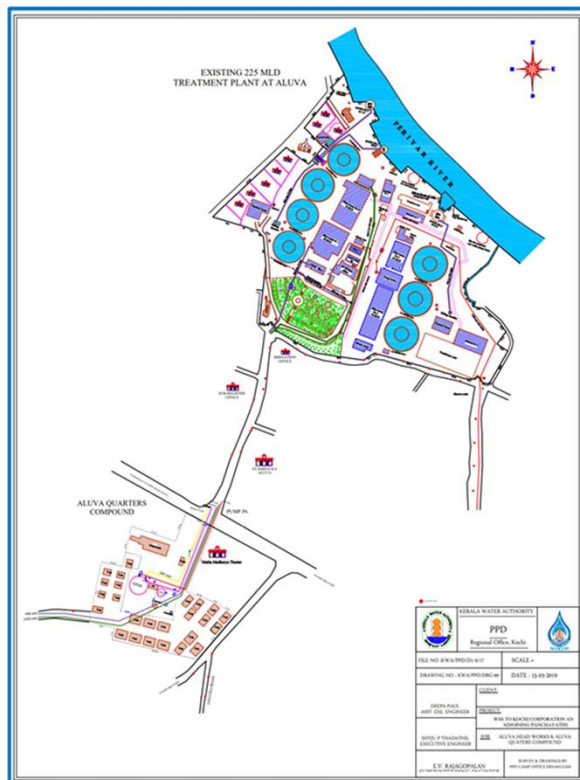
Existing WTP complex at Aluva and proposed site (Source: KWA, 2022).
